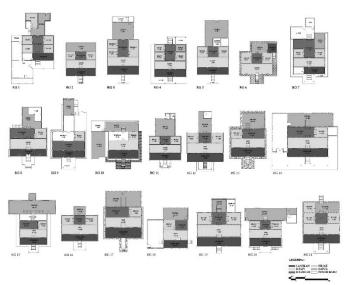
Floor Plan Source: Desy Aryanti, 2021
